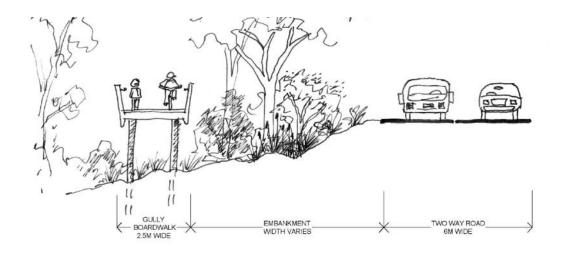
Typical cross section of Gully Boardwalk: Retaining the two-way road and providing an elevated boardwalk within dense indigenous vegetation and well offset from Lake Street traffic.
